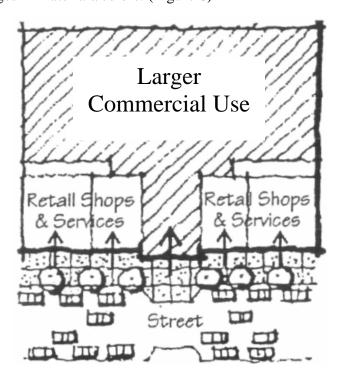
Reducing the Streetscape Impact of Large Building Masses
